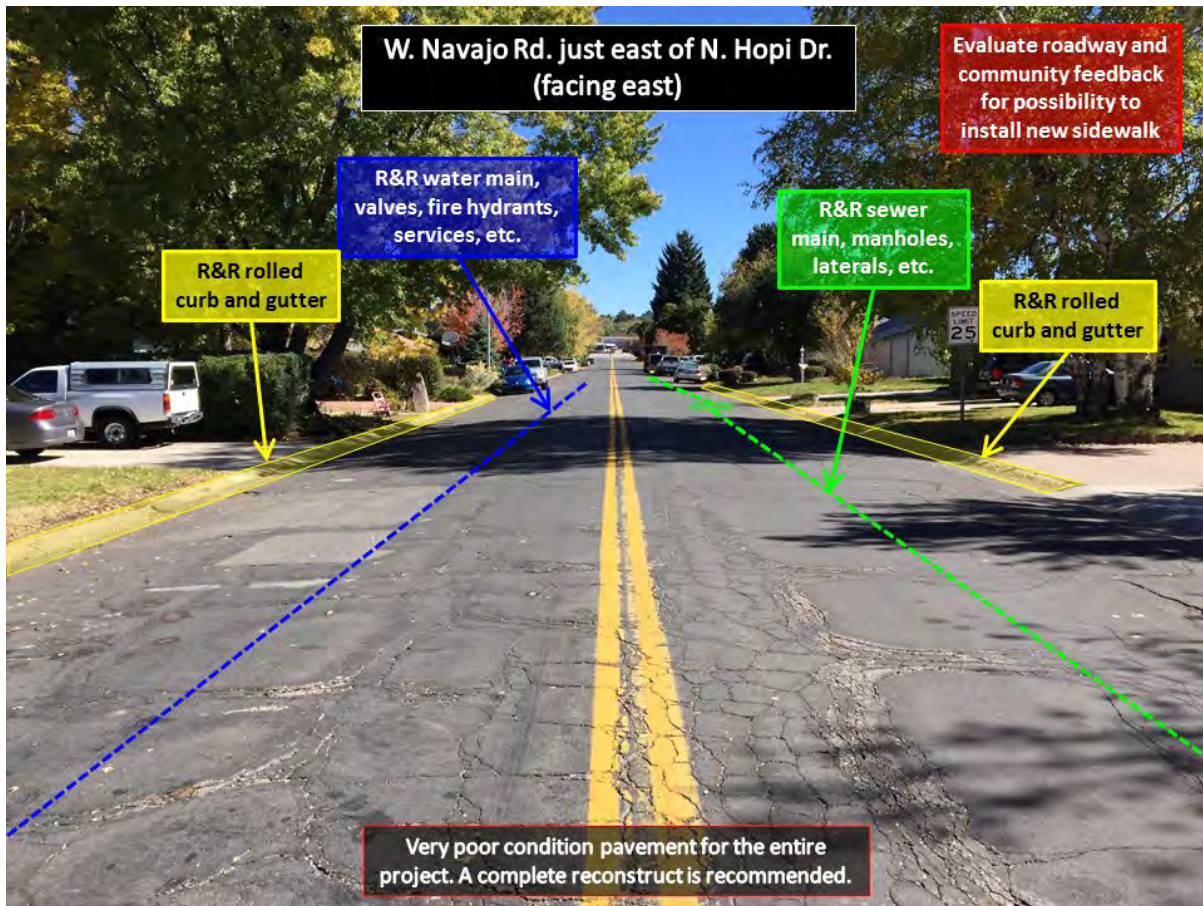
R&R water/sewer mains & appurtenances, pavement section, and rolled curb and gutter.
